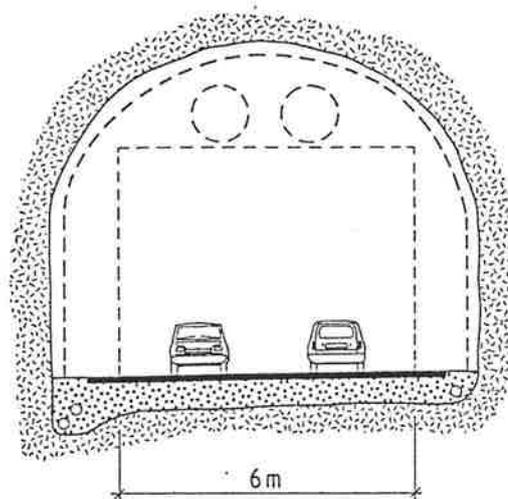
The cross section for a two lane road tunnel is 50 m²
